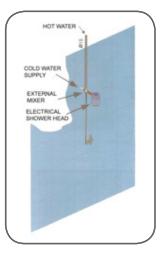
Detail of the mixer installed on the wall. Figure 8 – Photo of the mixer installed on the external pipes.
